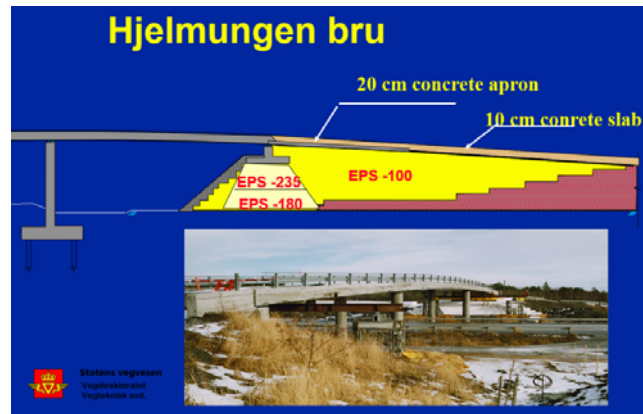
Abutment for multispan concrete bridge founded directly on Geofoam blocks with varying compressive strength (Norway)
